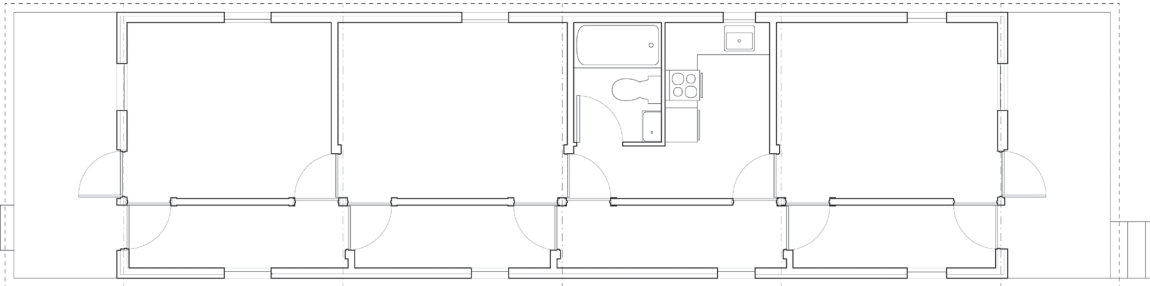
First Office, Duchamp’s Shotgun House, plan.
